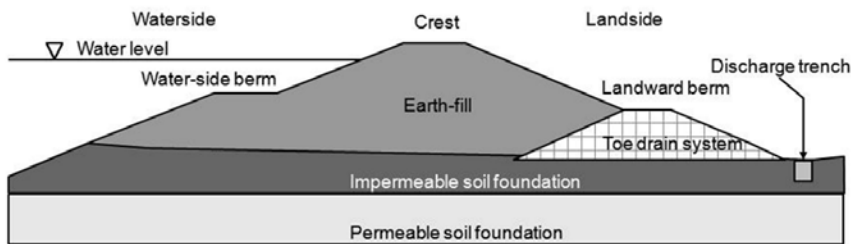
Homogeneous levee with berms on thin impermeable soil foundation
